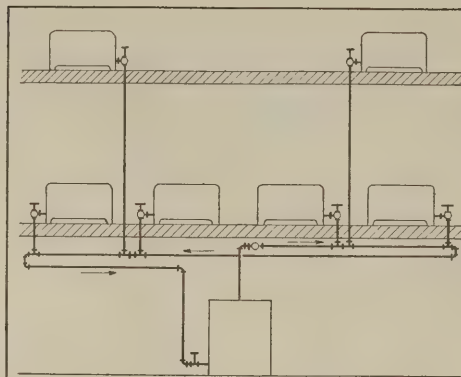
ONE PIPE RELIEF SYSTEM OF PIPING
